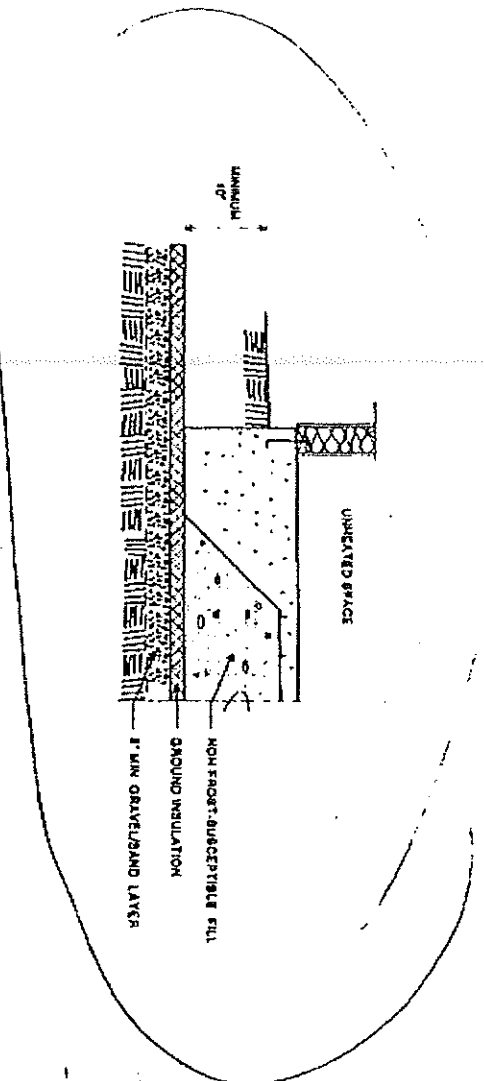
FPSF Design for Unheated Buildings with Insulation in Single Plane.
